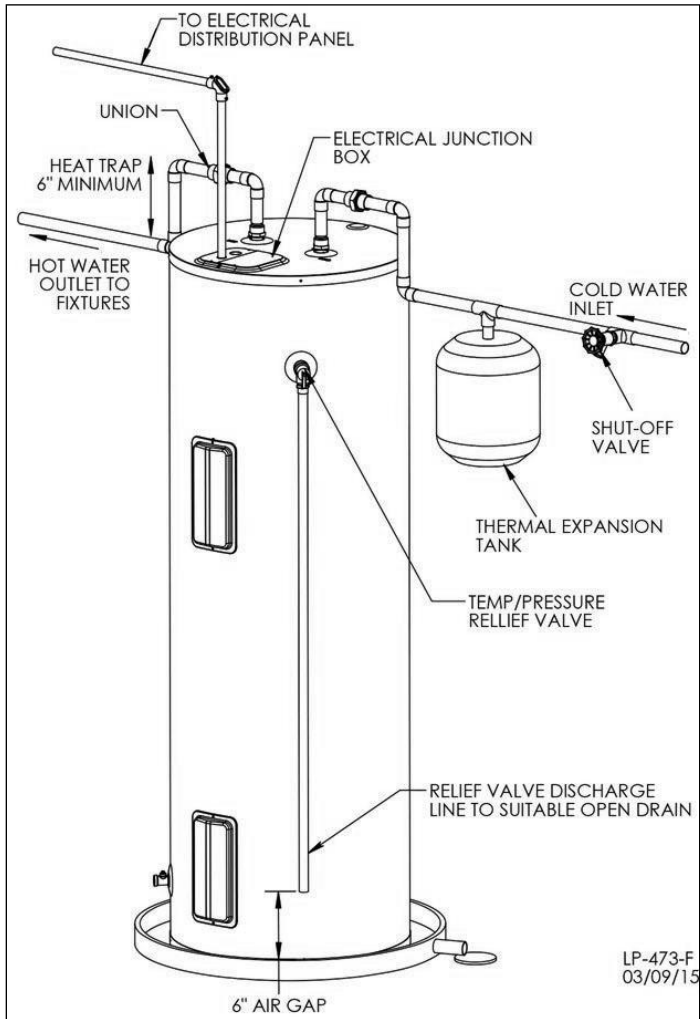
Piping Detail - NOTE: Drawing is meant to demonstrate system piping concept. Heat traps are optional.
